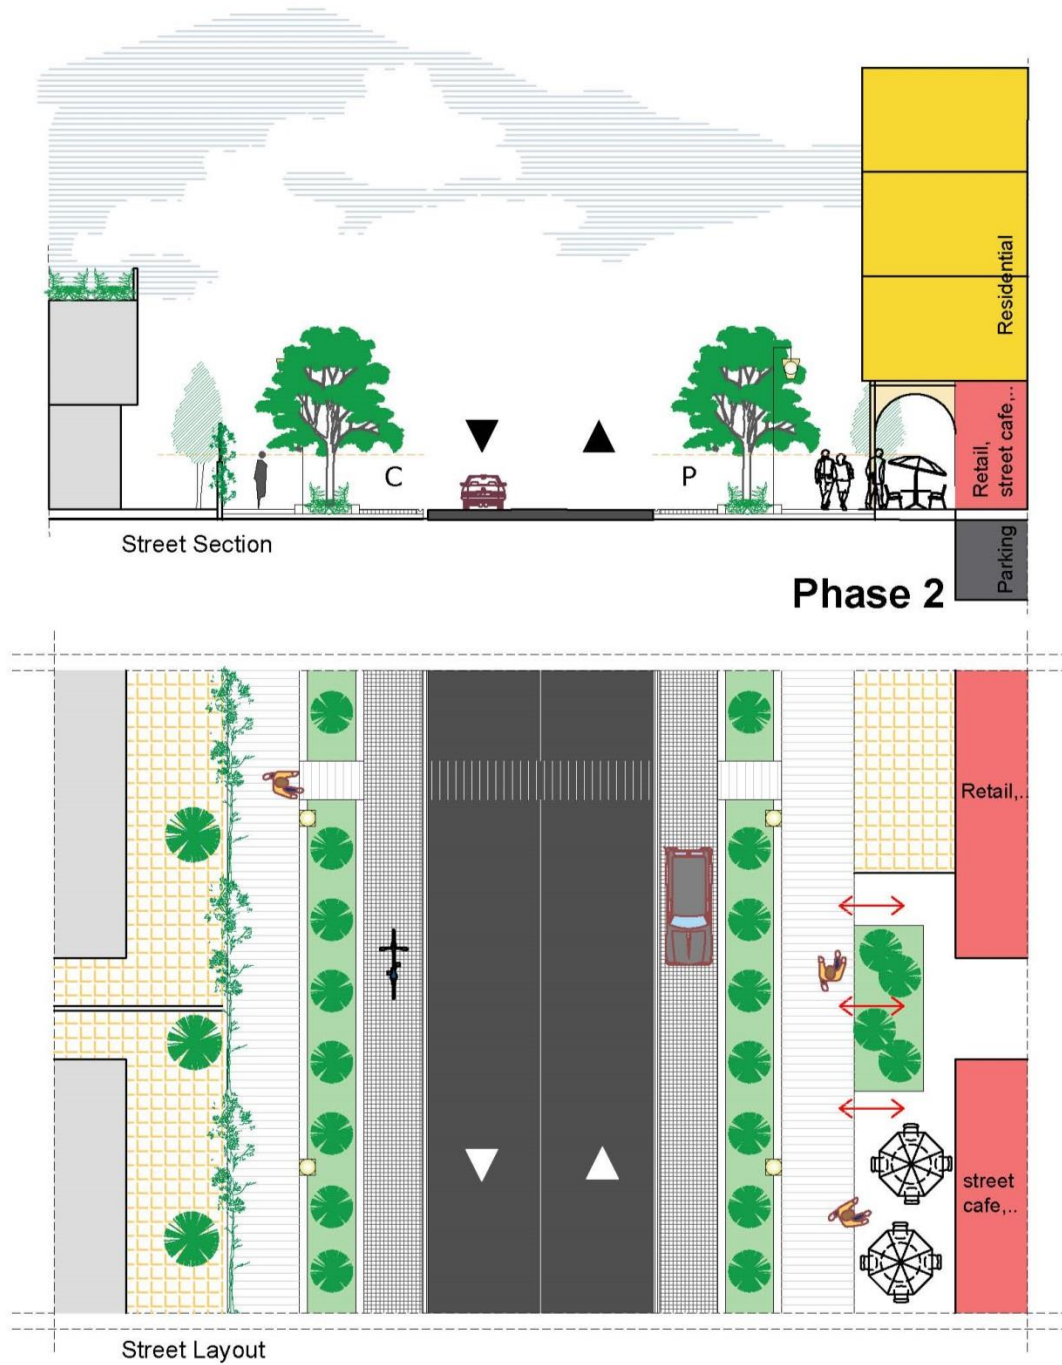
Street section and layout for the second stage proposal. (Source: Author)
